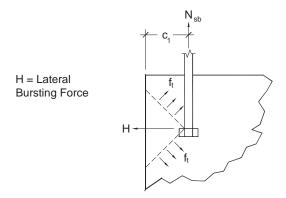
Lateral Bursting Forces for Anchor Rods in Tension Near an Edge
